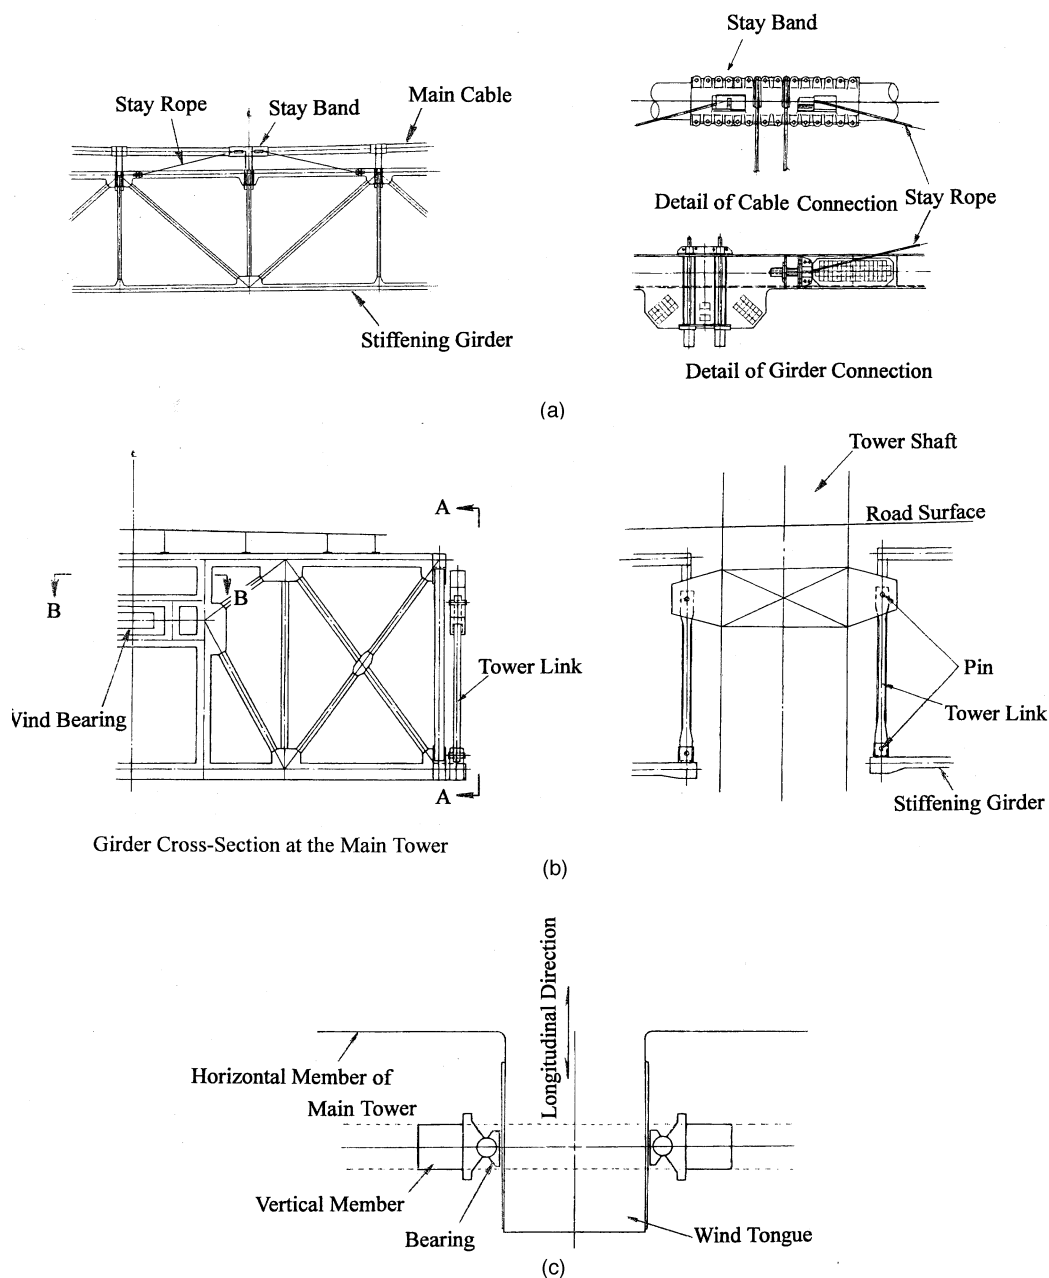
Supplemental components of the stiffening girder. (a) Center stay; (b) tower link (Section A-A); (c) wind bearing (Section B-B). (Source: Honshu-Shikoku Bridge Authority, Design of a Suspension Bridge, Japan, 1990. With permission.)
